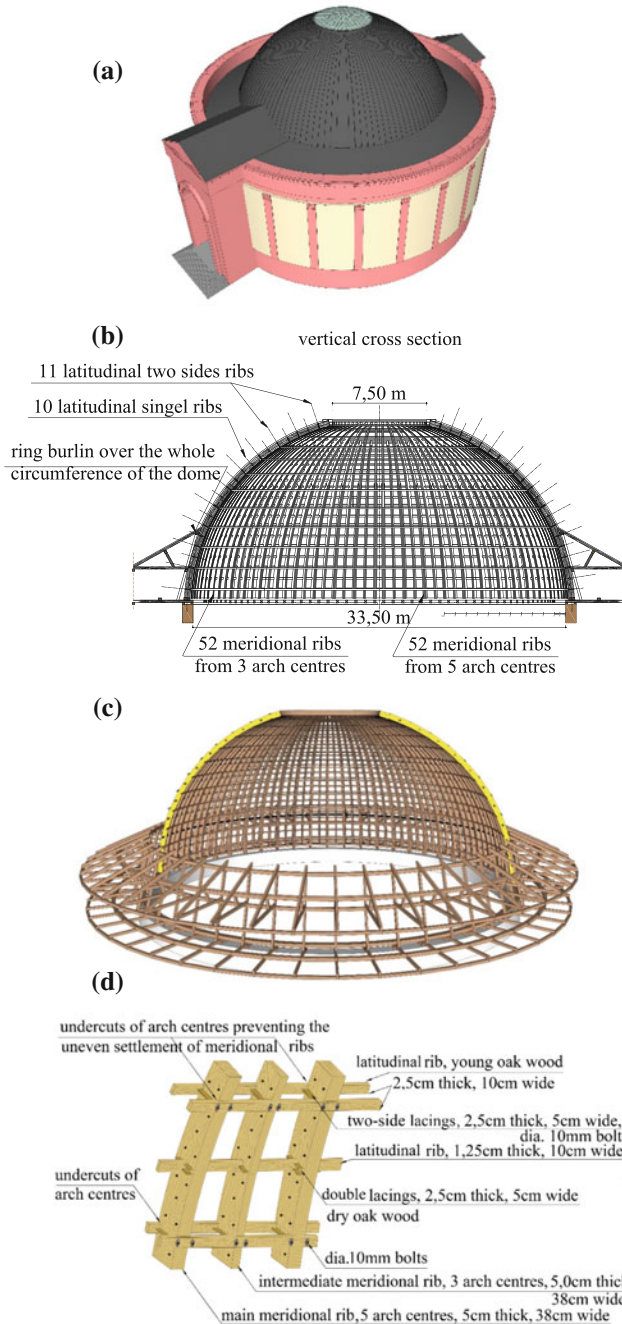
The Moller G.'s Dome in Darmstadt, Germany, of a 33.5 m span according to [13], a view of the Saint Louis Church in Darmstadt, b vertical section of the structure, c visualisation of the dome's structure, d details of the connection of the dome's meridional and latitudinal ribs
